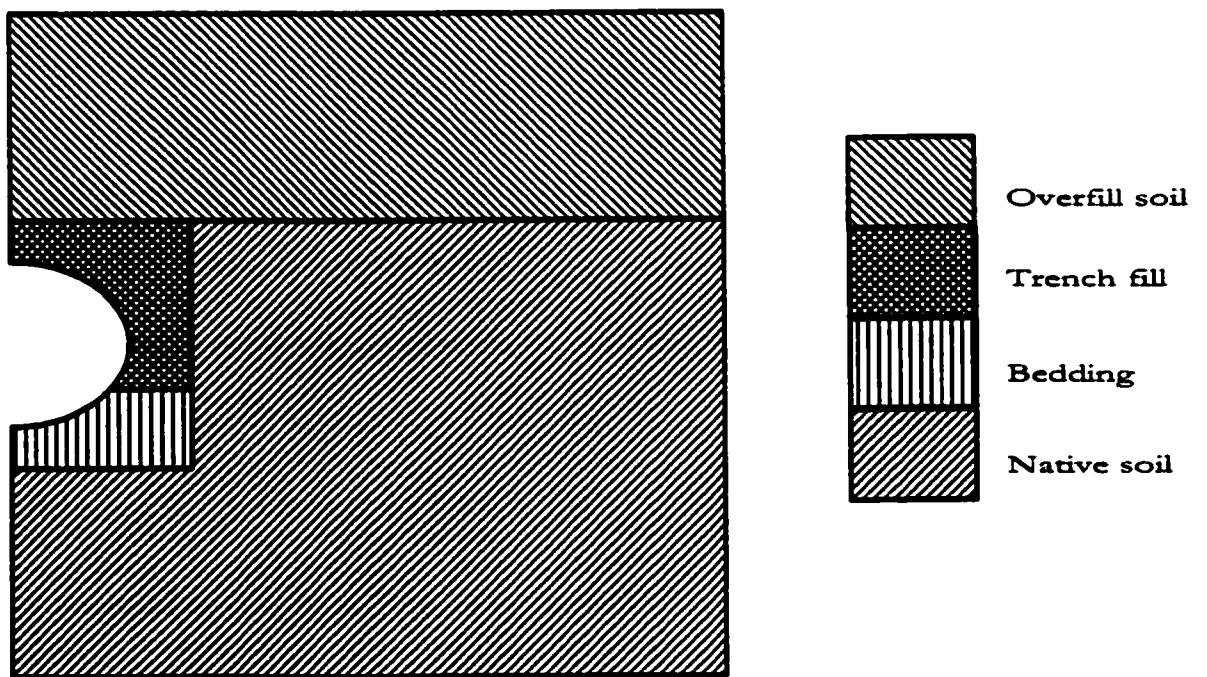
Construction increment sequence for trench type of installation (CANDE)
